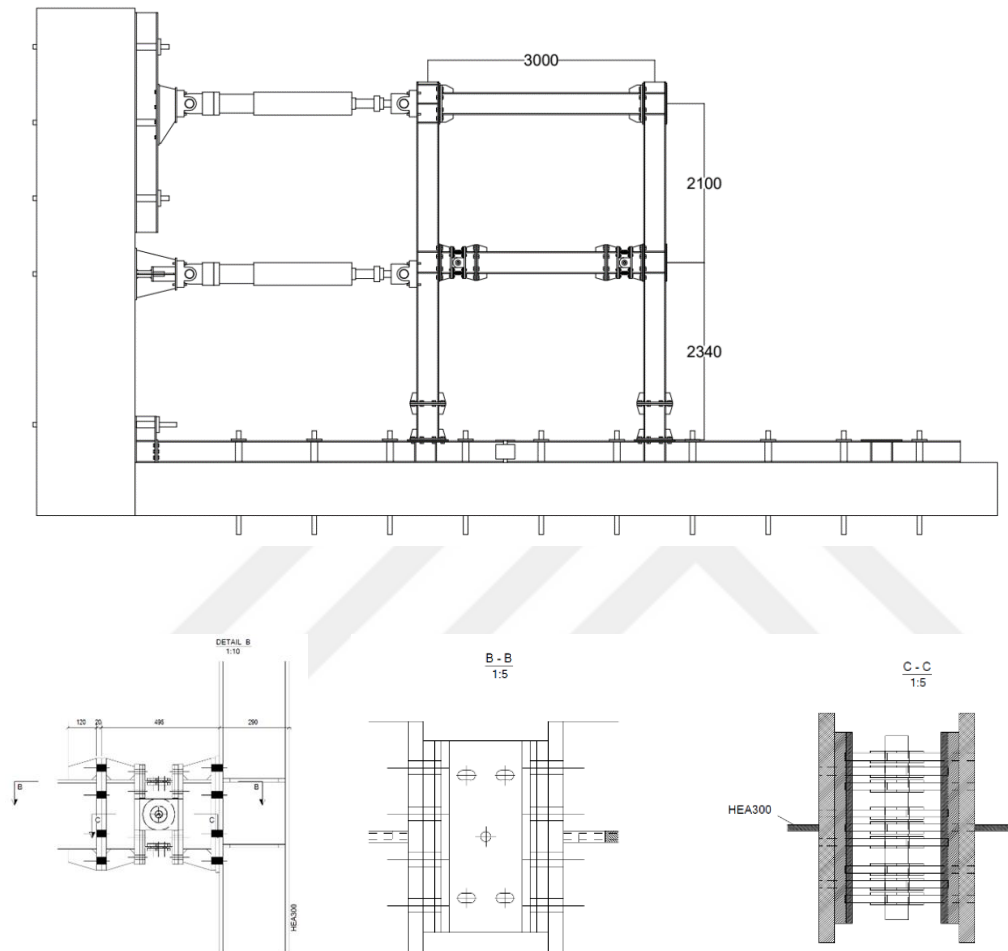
Elevation view and detail views of one-bay test frame and P-Cells
